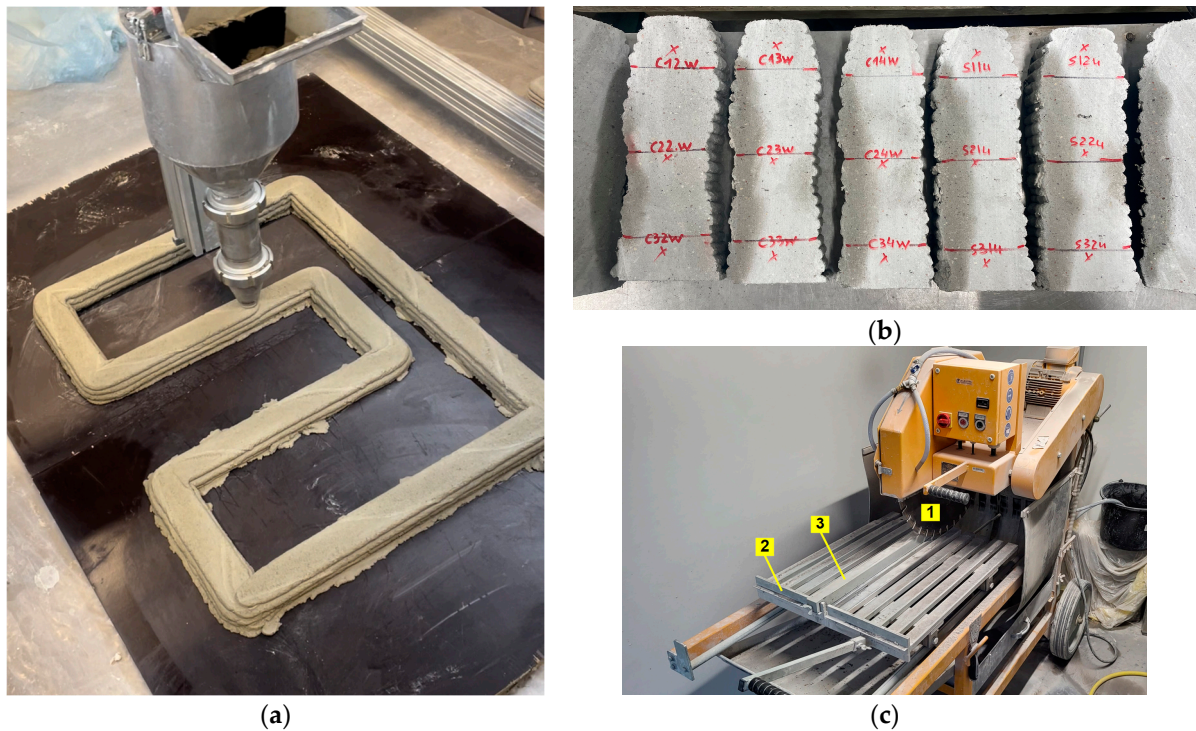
Specimen preparation for mechanical tests: (a) print object geometry for mechanical tests; (b) markings on specimens before cutting; (c) circular saw table: (1) circular saw blade; (2) metal guide fixed perpendicular to the saw blade; (3) metal guide fixed parallel to the saw blade.
